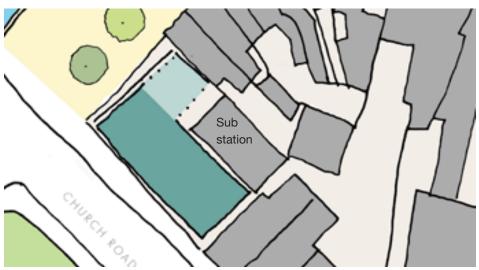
A sketch showing a plan for a new building on the corner of Church Road, wrapping around the existing substation and addressing both Church Road and the new public space on Church Street. The darker blue indicates the location of the new building and the lighter blue shows the location of the arch and access to the sub station at ground floor, which the building could extend above.
